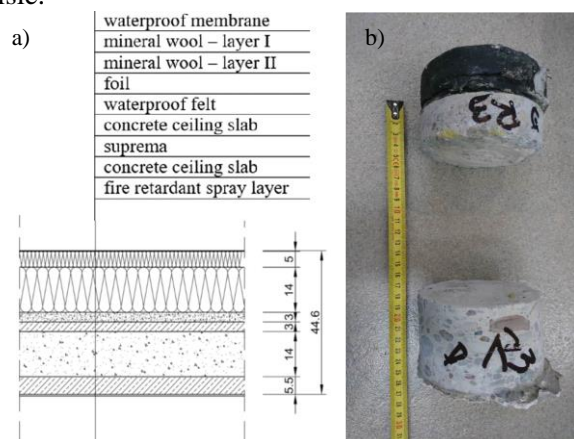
Layers over the side aisle, a) layering, b) drill-hole elements
